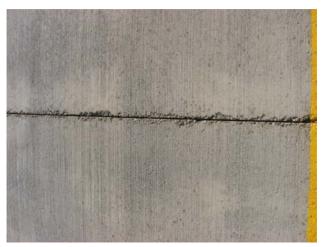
Excessive joint spalling on the eastbound direction of Cruger Road, as well as poor surface texture.
